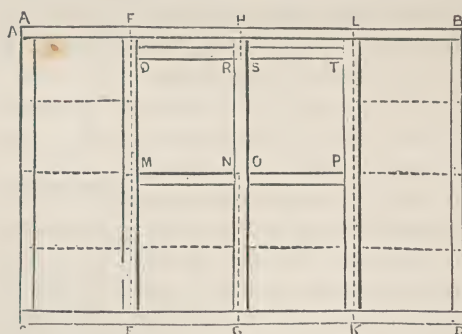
FRONT OF CONCRETE SLAB BUILDING.
